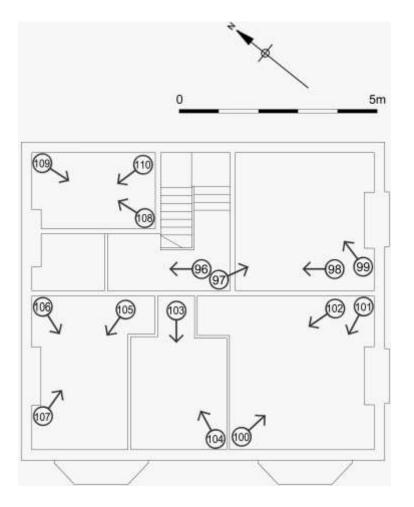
First floor plan of the building showing the location & direction of views of the bedrooms (Figs.96-107) and bathroom (Figs.108-110)
